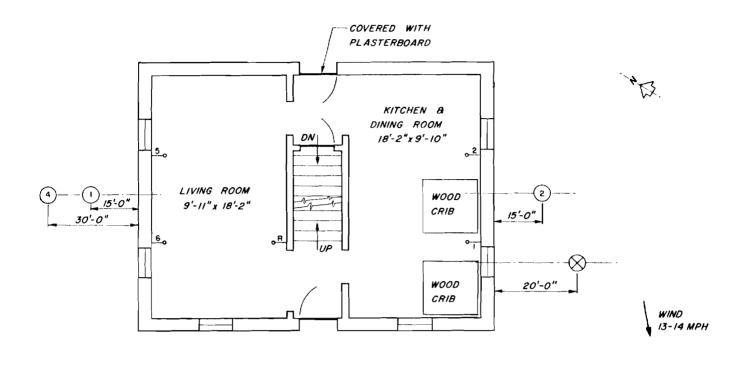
BUILDING No. 2 - TWO - STOREY SOLID BRICK DWELLING
